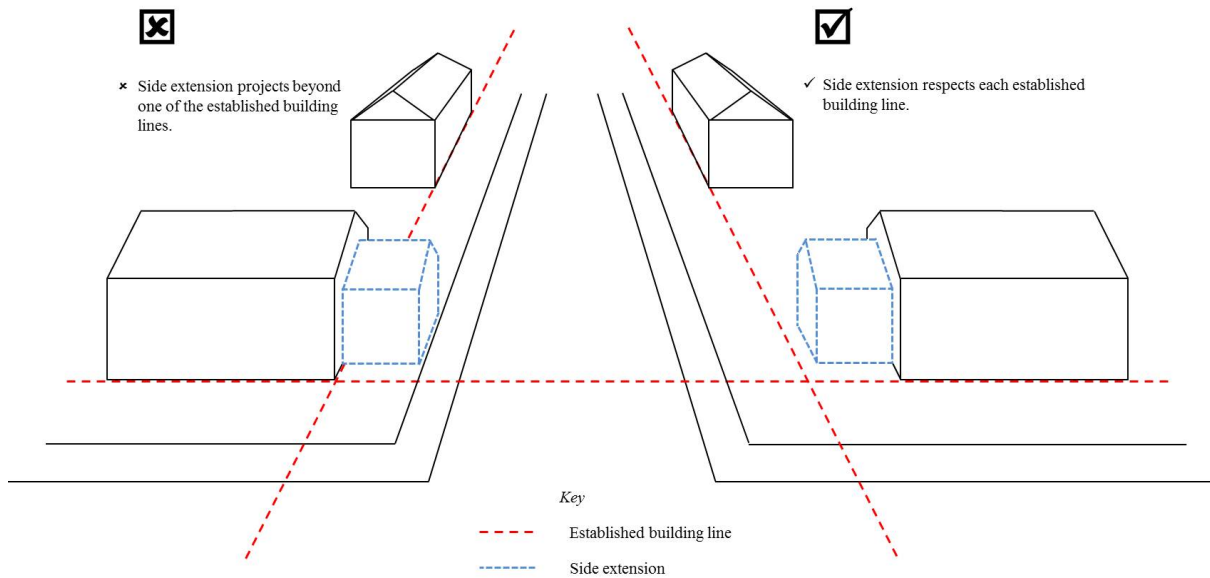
Acceptable and unacceptable side extensions at corner buildings
